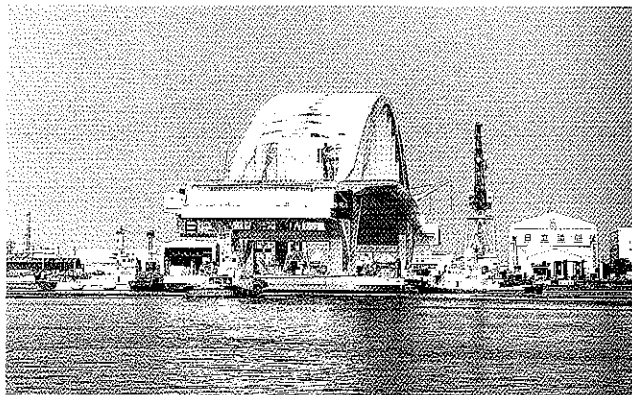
Floating Bridge Is Being Pulled out of the Dock
